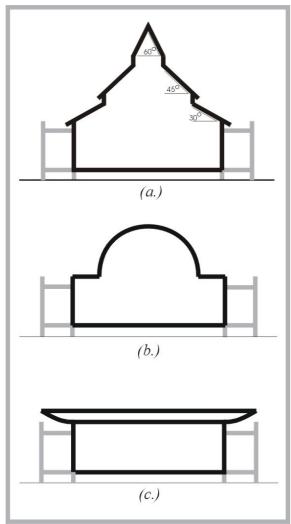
Basic roof shape, (a) pyramidal-tier roof, (b) Dome-roof, (c) flat-roof
